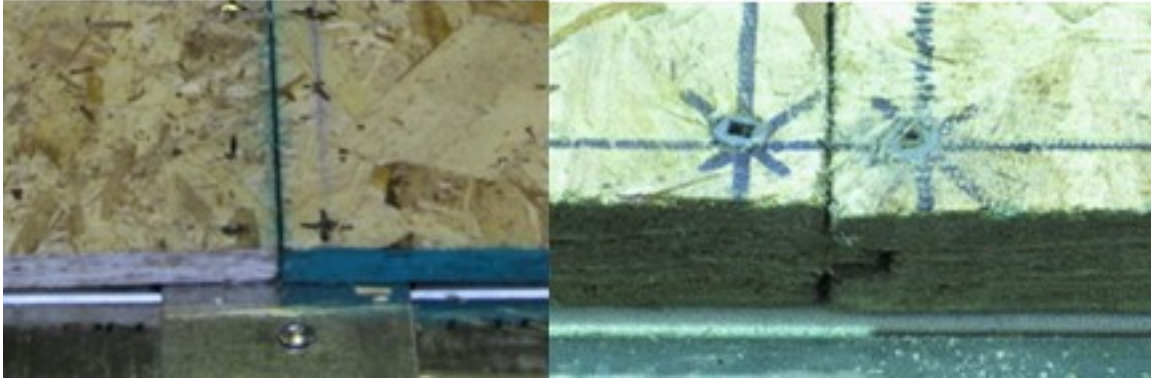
(Left) Square Edge Roof OSB (Right) Tongue-and-Groove Floor OSB
